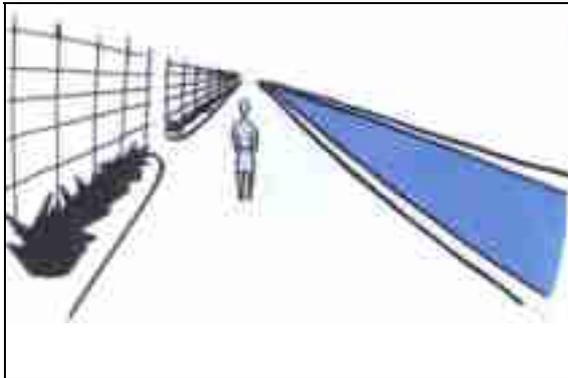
An example of the fencing or railings combined with dense planting allowing glimpses through but make it difficult to climb.
